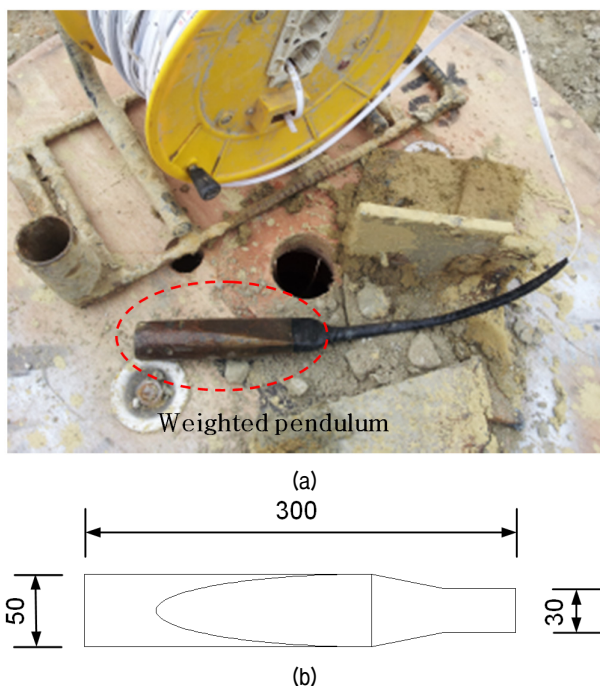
Weighted pendulum: (a) photograph, (b) schematic drawing. The units are millimeters
